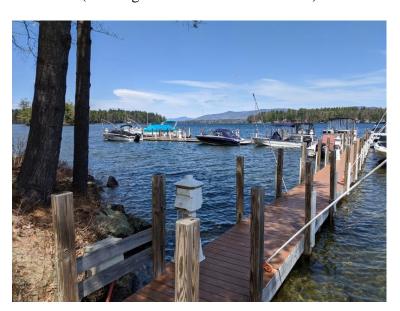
View East of 'Eastern' Existing Docks to be Reconfigured at Proposed Location of Boat Launch & Negative Lifts
